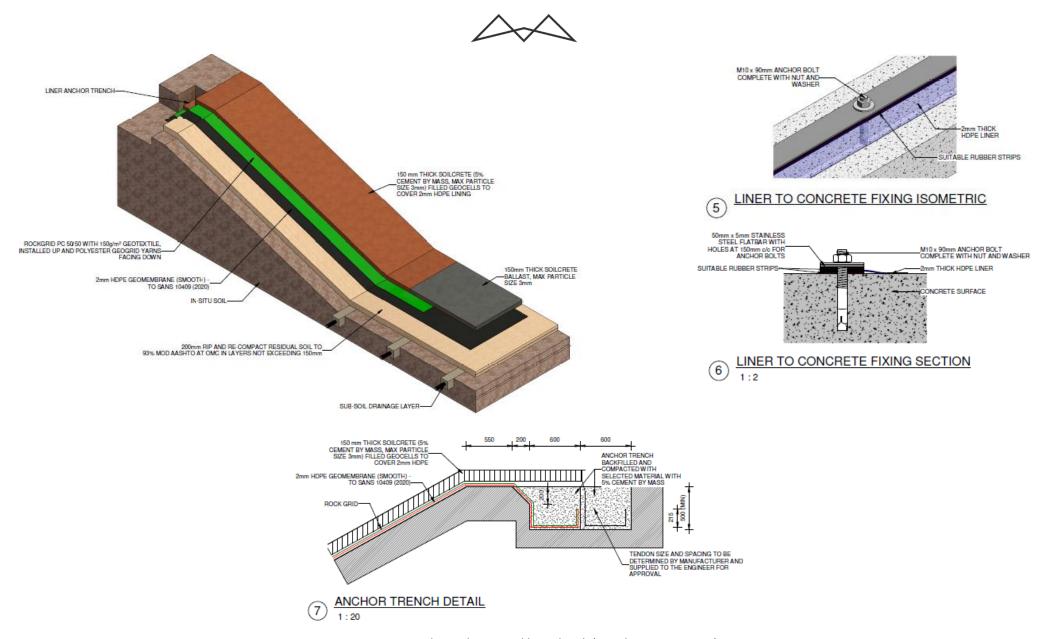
Proposed RWD layout and liner detail. (Eco Elementum, 2025)
